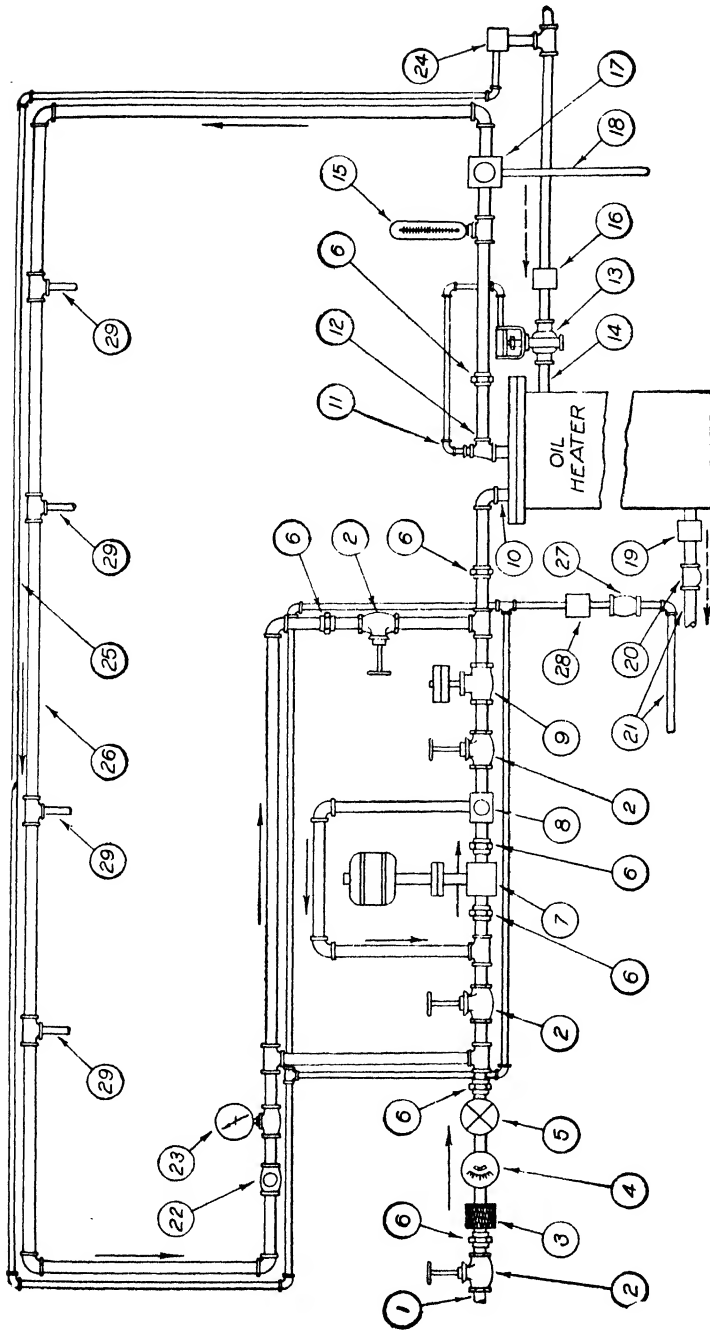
A complete oil-burner installation. (1) Supply line from oil system. (2) Globe valve. (3) 2-in. edge plate oil filter. Type EF 250 lb. (4) Buffalo oil meter. (5) Reducing valve. (6) Hauck 300 gph circulating-oil pump. (8) Pressure relief valve, 1-in. size. (9) Automatic oil shut-off valve. (10) Oil inlet to oil heater. (11) Automatic oil-temperature steam control. (12) Oil outlet from oil heater. (13) Automatic oil-temperature steam control. (14) Steam inlet to oil heater. (15) Oil thermometer. (16) Fisher strainer,  $\frac{1}{4}$ -in. size, Type 260. (17) Relief valve, 1-in. size. (18) Relief oil line to sump or barrel. (19) Relief oil line to sump or barrel. (20) Fisher steam trap,  $\frac{3}{8}$ -in. size, Type ST. (21) Condensate discharge to sump. (22) Check valve. (23) Oil pressure gage. (24) Steam-pressure reducing valve, 50 to 5 lb. (25) Steam-tracer line,  $\frac{1}{2}$ -in. iron pipe or copper tubing. (26) Loop oil line to burners. (27) Steam trap,  $\frac{1}{2}$ -in. size, Type ST. (28) Fisher strainer,  $\frac{1}{2}$ -in. size, Type 260. (29) Leads to burners. (Courtesy of Hauck Manufacturing Company.)
